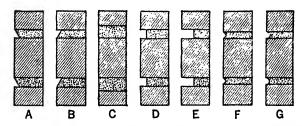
Common Types of Joints. (a) Struck joint, (b) weathered joint, (c) flush or plain cut joint, (d) raked joint, (e) stripped joint, (f) "V" joint, (g) concave joint.
